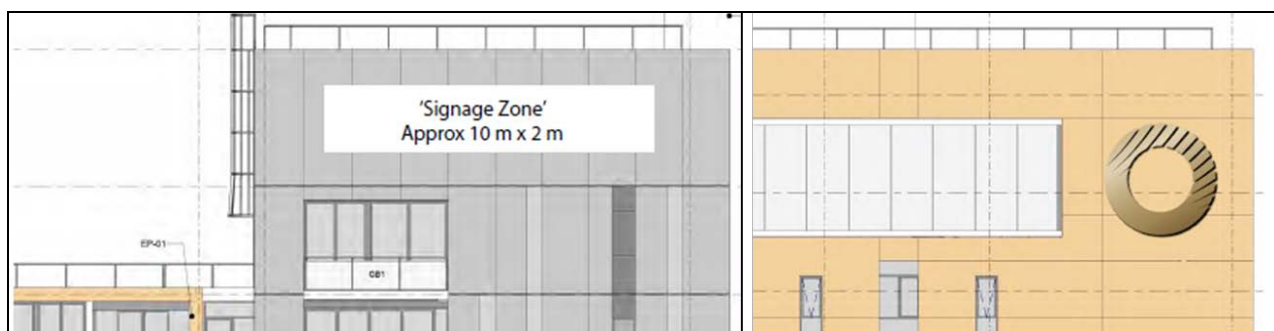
Signage zone (left) and Crown logo sign (right) at roof level (Source: proponent's RtS)
